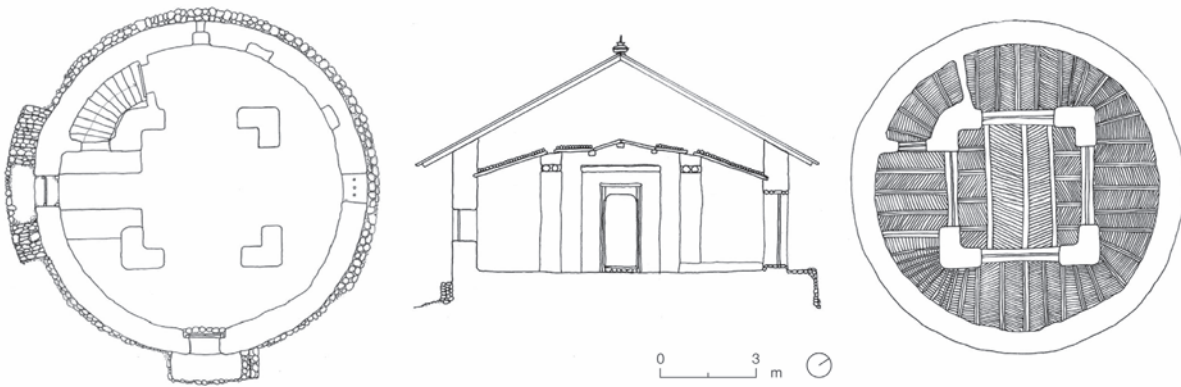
Circular house in Kebele 11, plan (left), section (center), ceiling plan right). This house plan correspond to the top-right house in Fig.3-8
